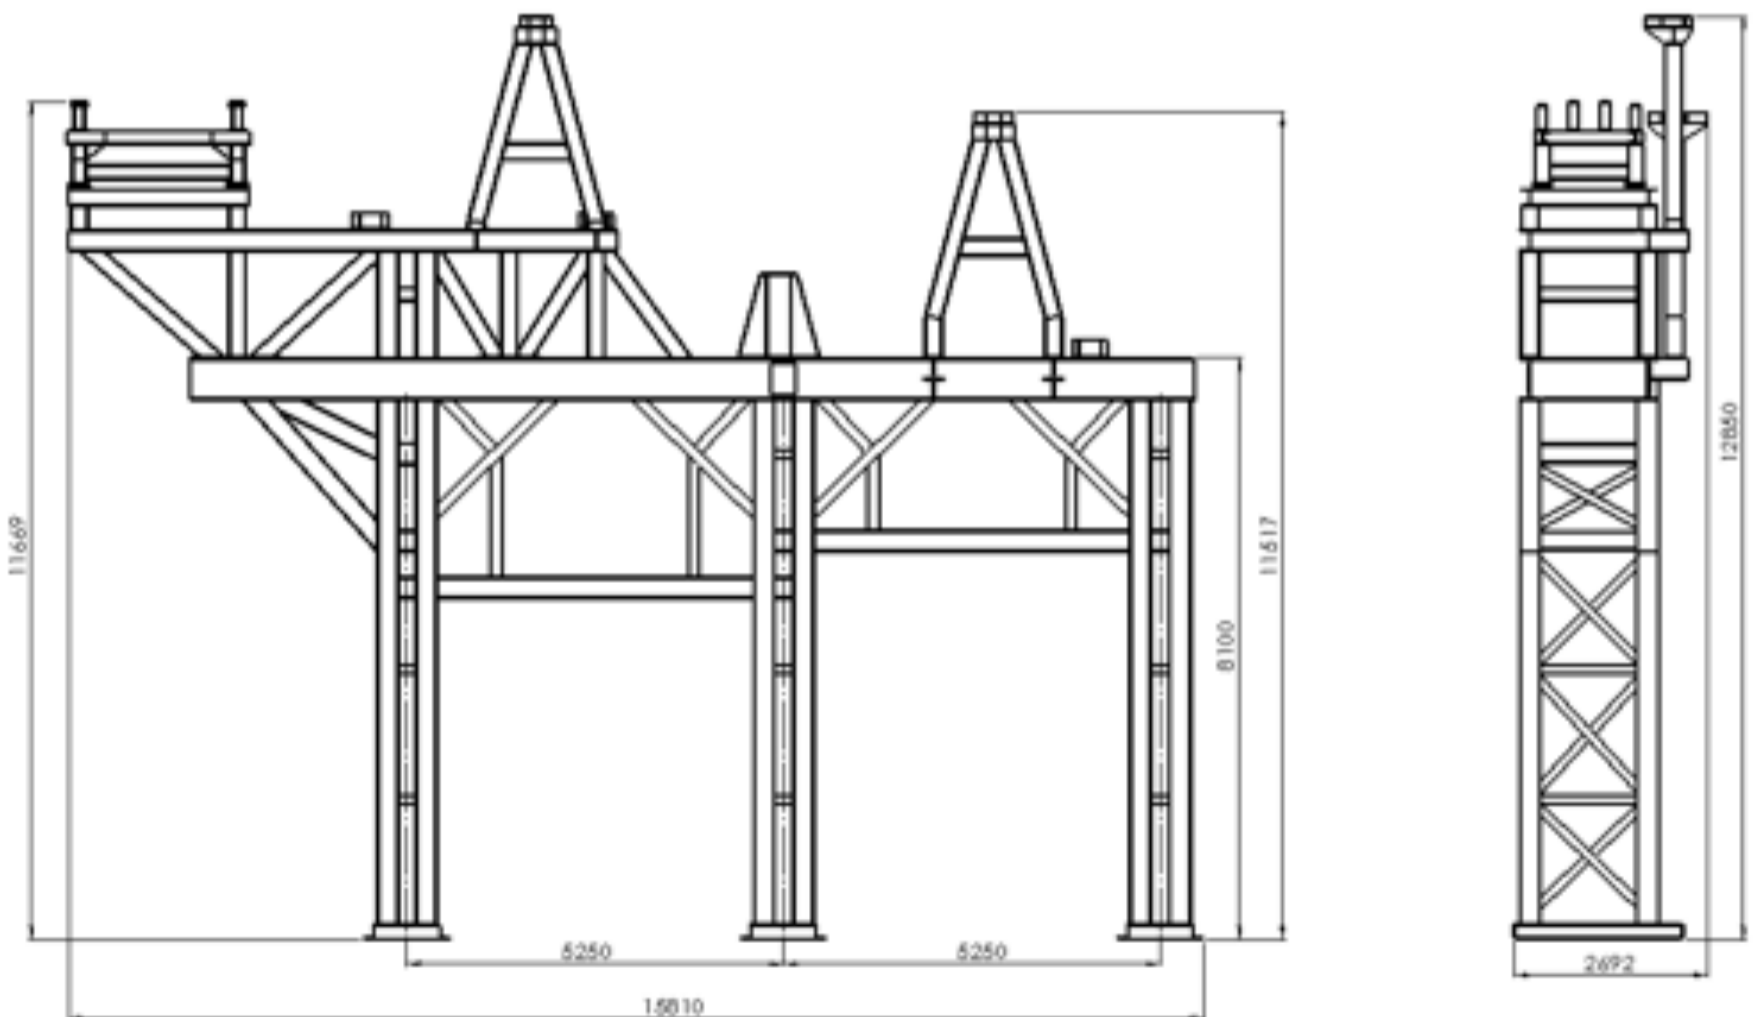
View of a single section of the designed enclosure structure for feeders and vibrating screens - overall envelope dimensions (GA/plan view).
